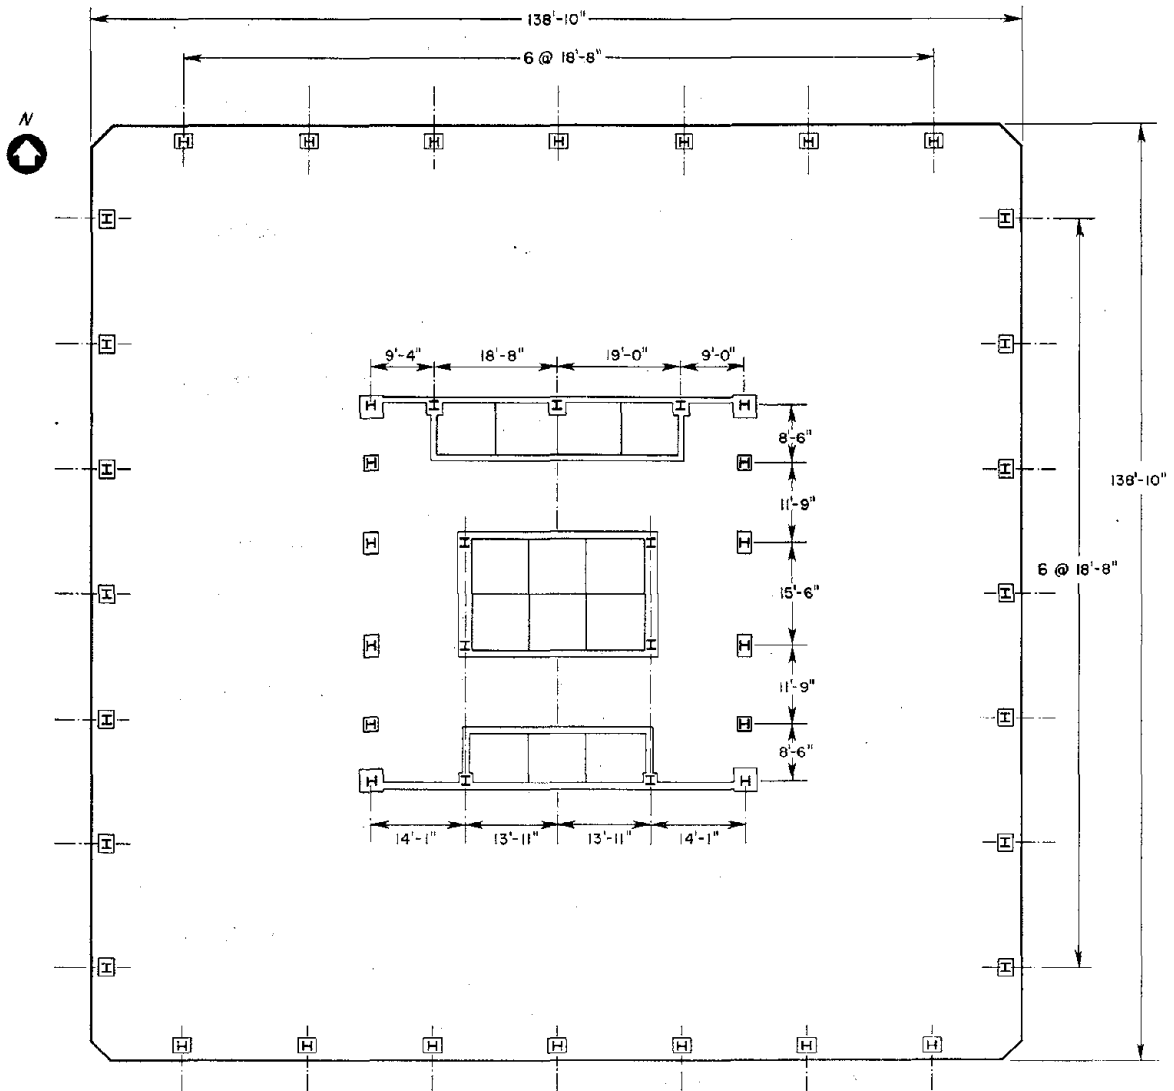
TYPICAL FLOOR PLAN SHOWING ARRANGEMENT OF COLUMNS
